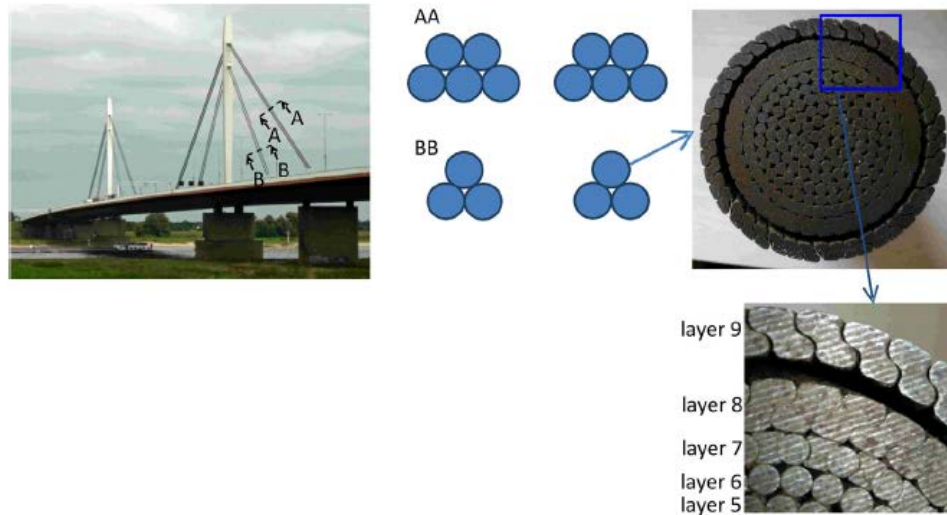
OVERVIEW OF THE EWIIK BRIDGE WITH ITS STAY CABLES (MALJAARS & VROUWENVELDER, 2014).
